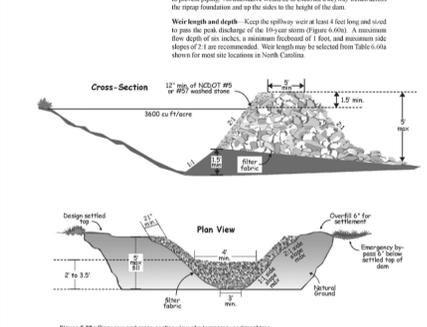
Plan view and cross-section view of a temporary sediment trap.
